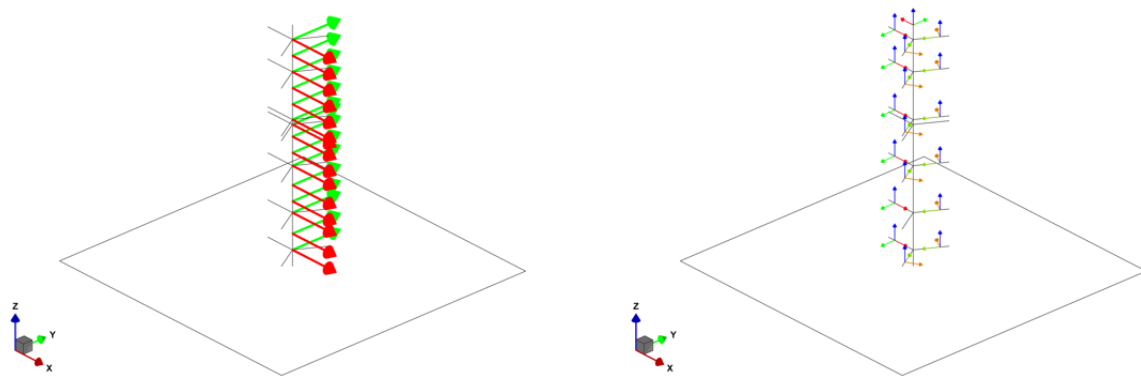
Sensor layout including 84 uniaxial accelerometers: Left: 30 sensors attached to the mast, Right: 54 sensors attached to the booms.
